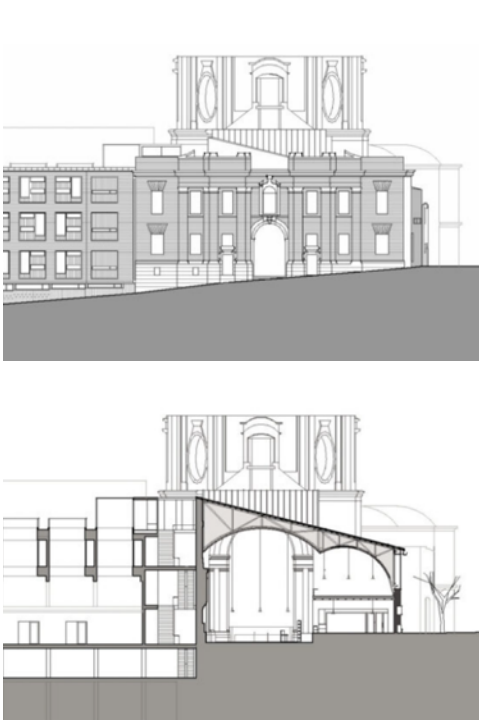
Facade and section drawings showing the relationship between the ruins and the intervention.
